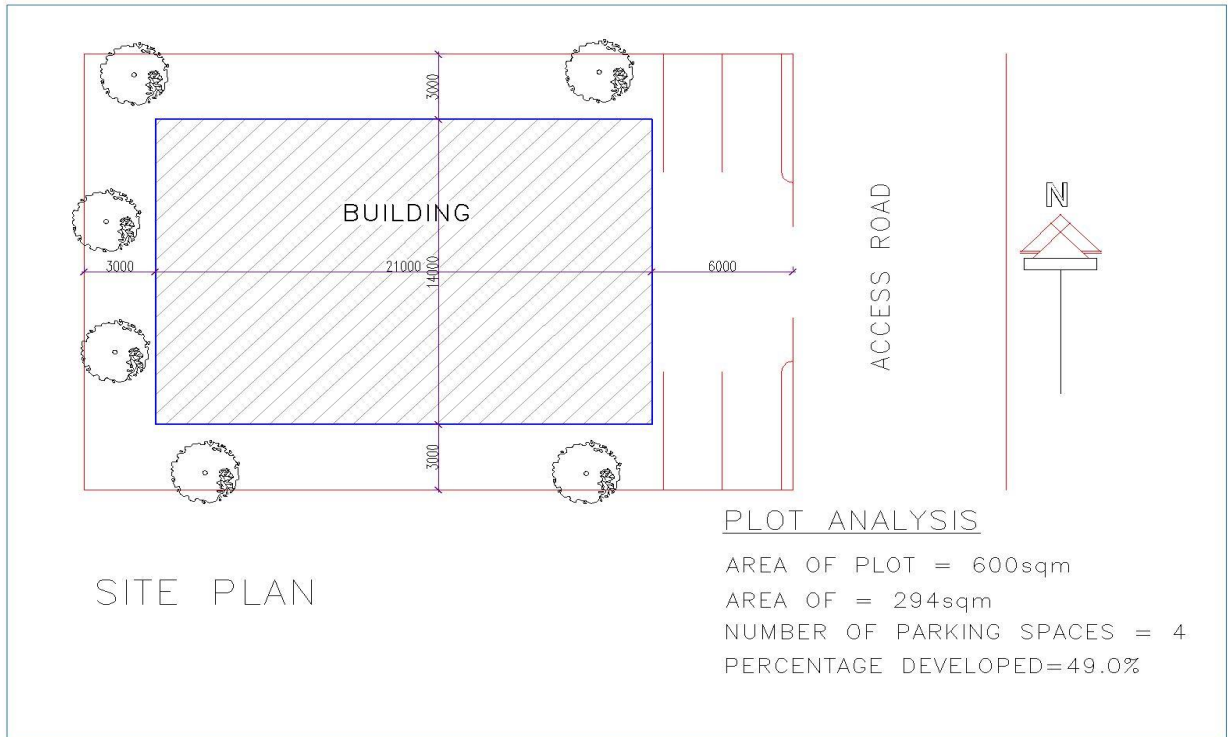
Site plan of a 600sqm plot in Gwagwalada.
